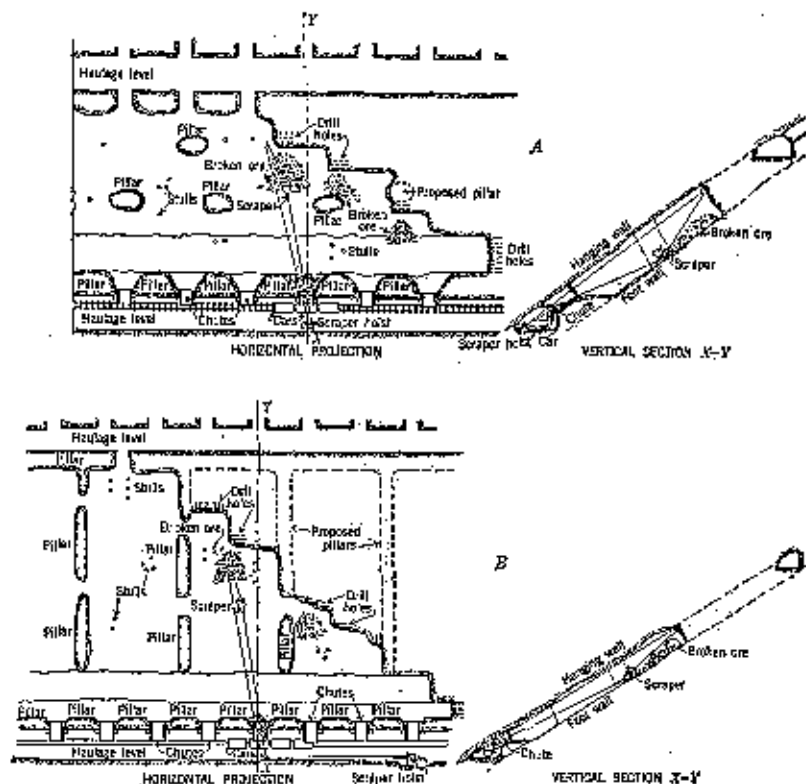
Open stoping, Michigan copper mines: A, Large open stope with irregular pillars; B, long, narrow stopes separated by narrow pillars.
